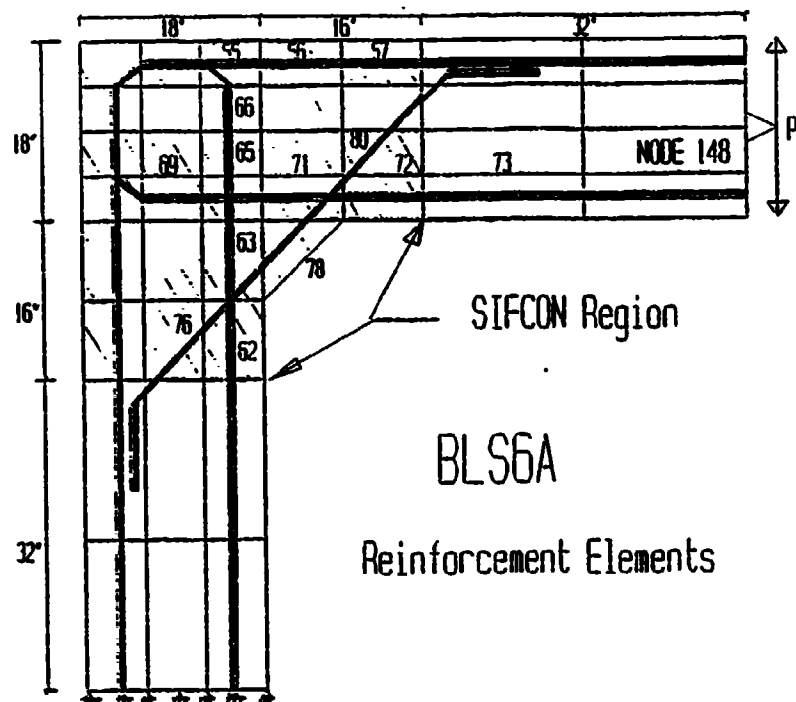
Connection detail BLS6A with SIFCON material and labeled steel reinforcement elements.
